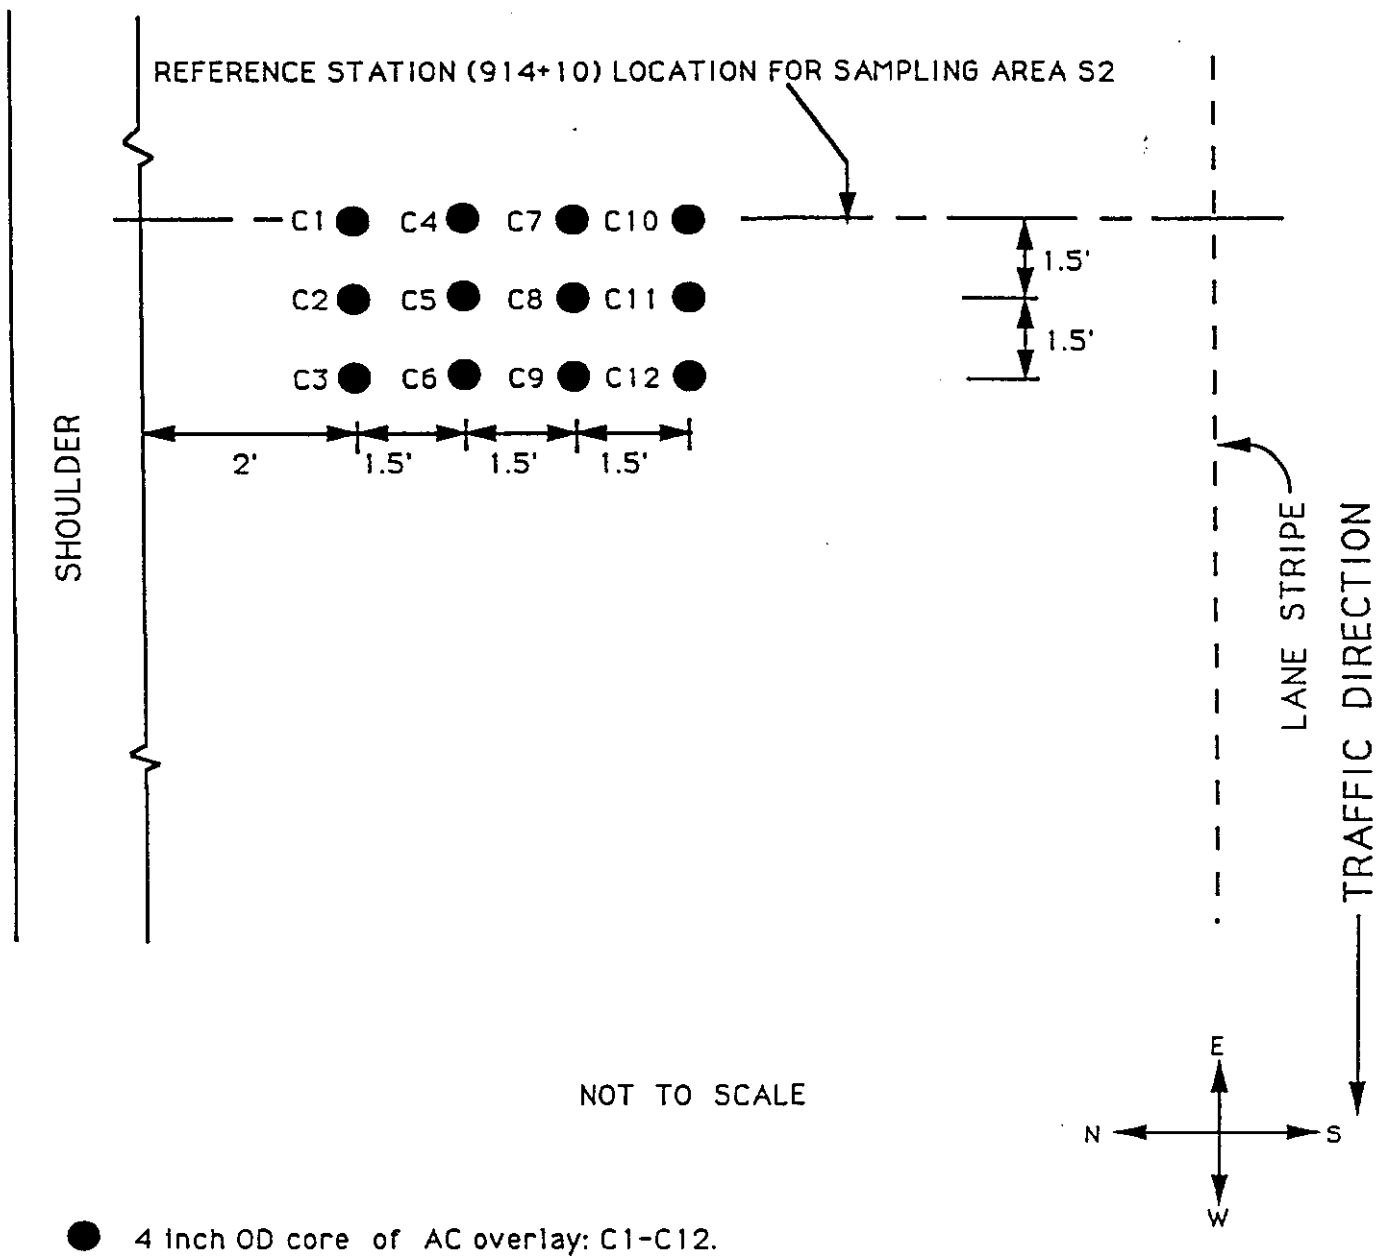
After overlay sampling plan for station 914+10 before section 4. Sampling area S2.
